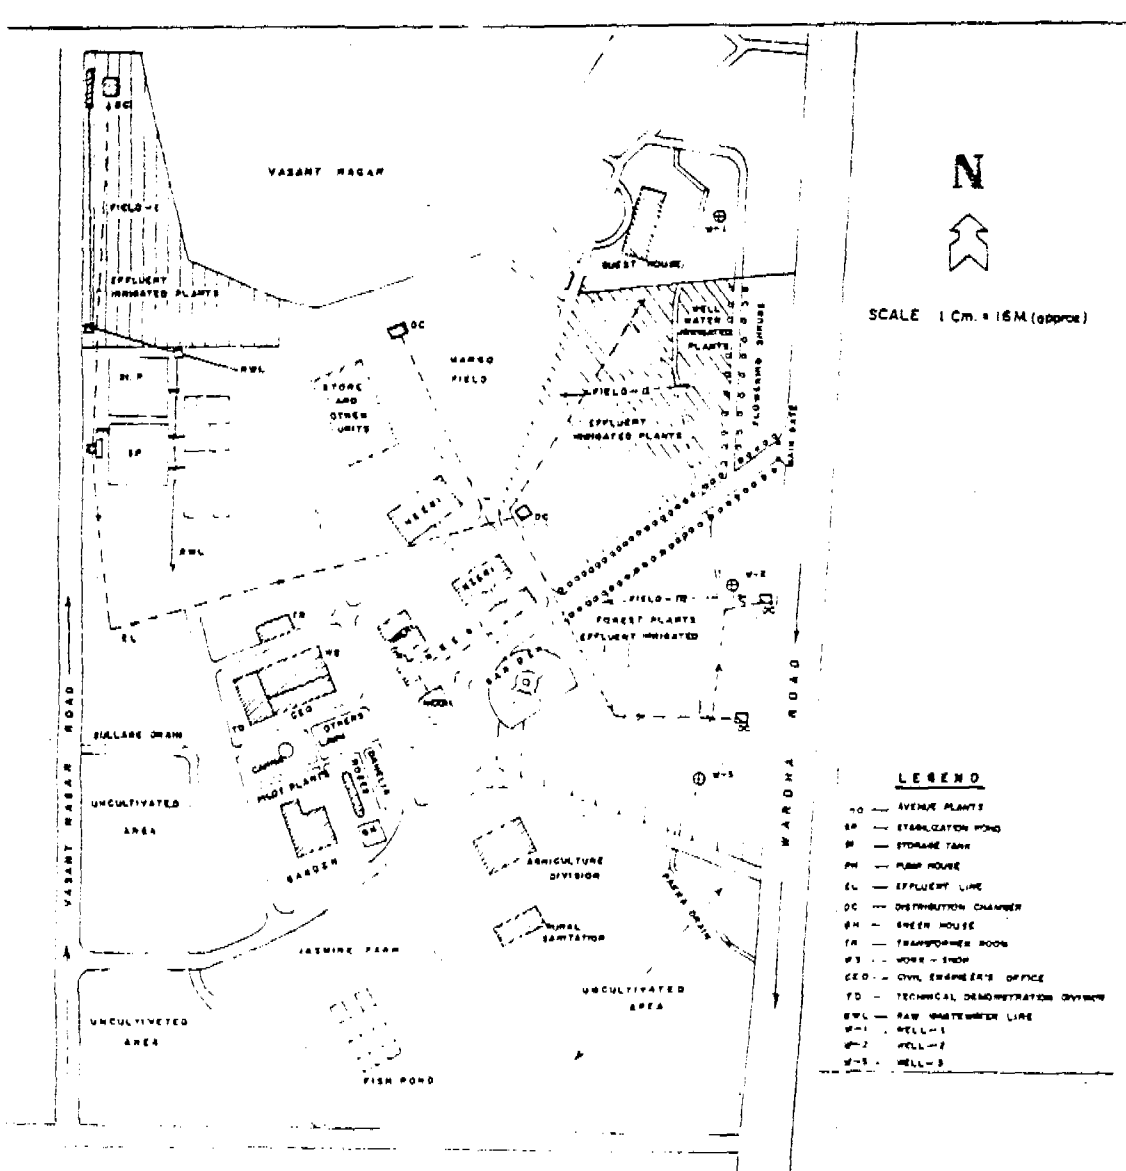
SITE PLAN FOR UTILIZATION OF STABILIZATION POND EFFLUENT FOR ORANGE, FOREST, AVENUE AND ORNAMENTAL PLANTS.
